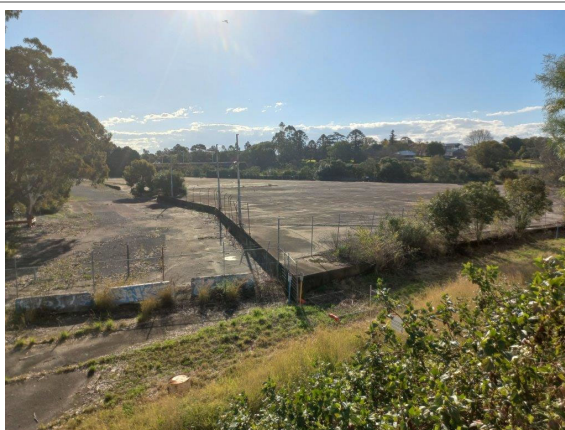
View west from Parramatta Light Rail bridge at north Camellia, foreground shows project footprint.
